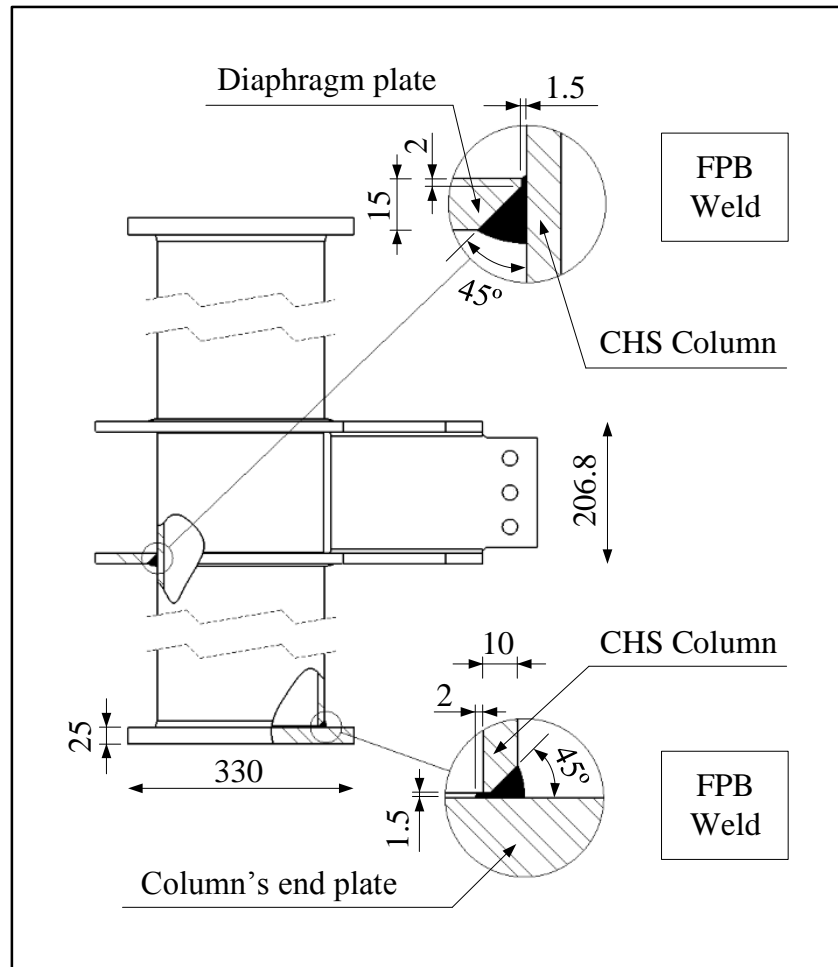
The column assembly - dimensions in [mm]
